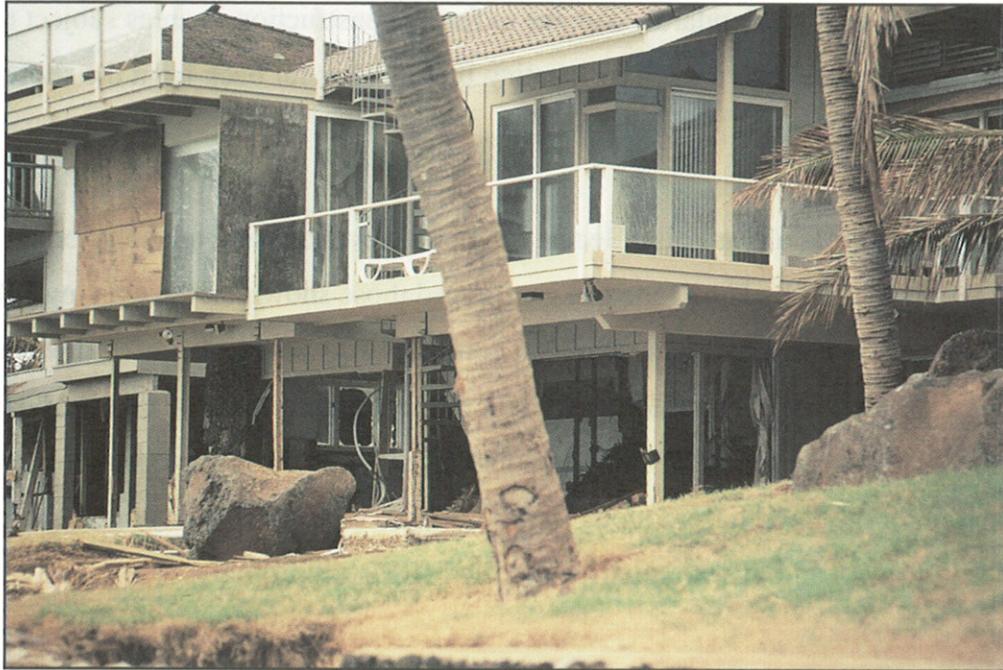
Non-elevated buildings at Poipu Beach. Lower area gutted; upper area suffered much less flood damage. Note transported lava rock debris, which can cause additional damage.
